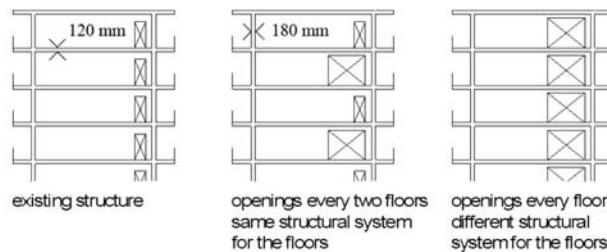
Possible interventions: a) existing structure; b) openings every two floors c)opening every floor
